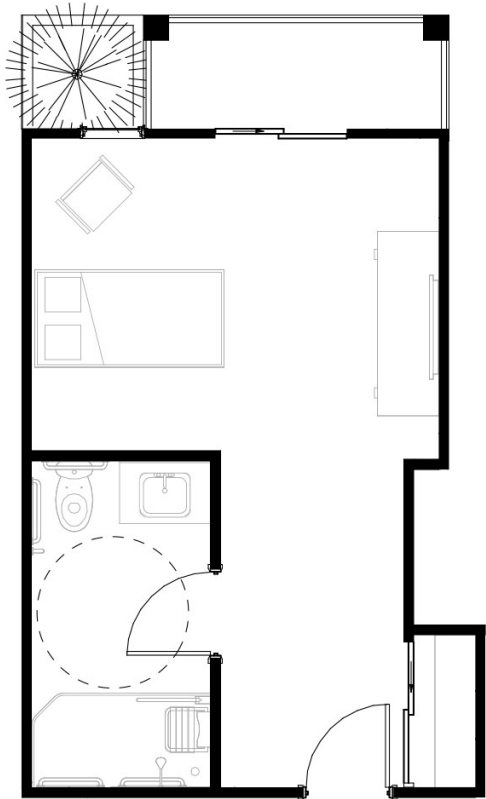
Unit Type 1 Floor Plan | Scale: 1:75.
